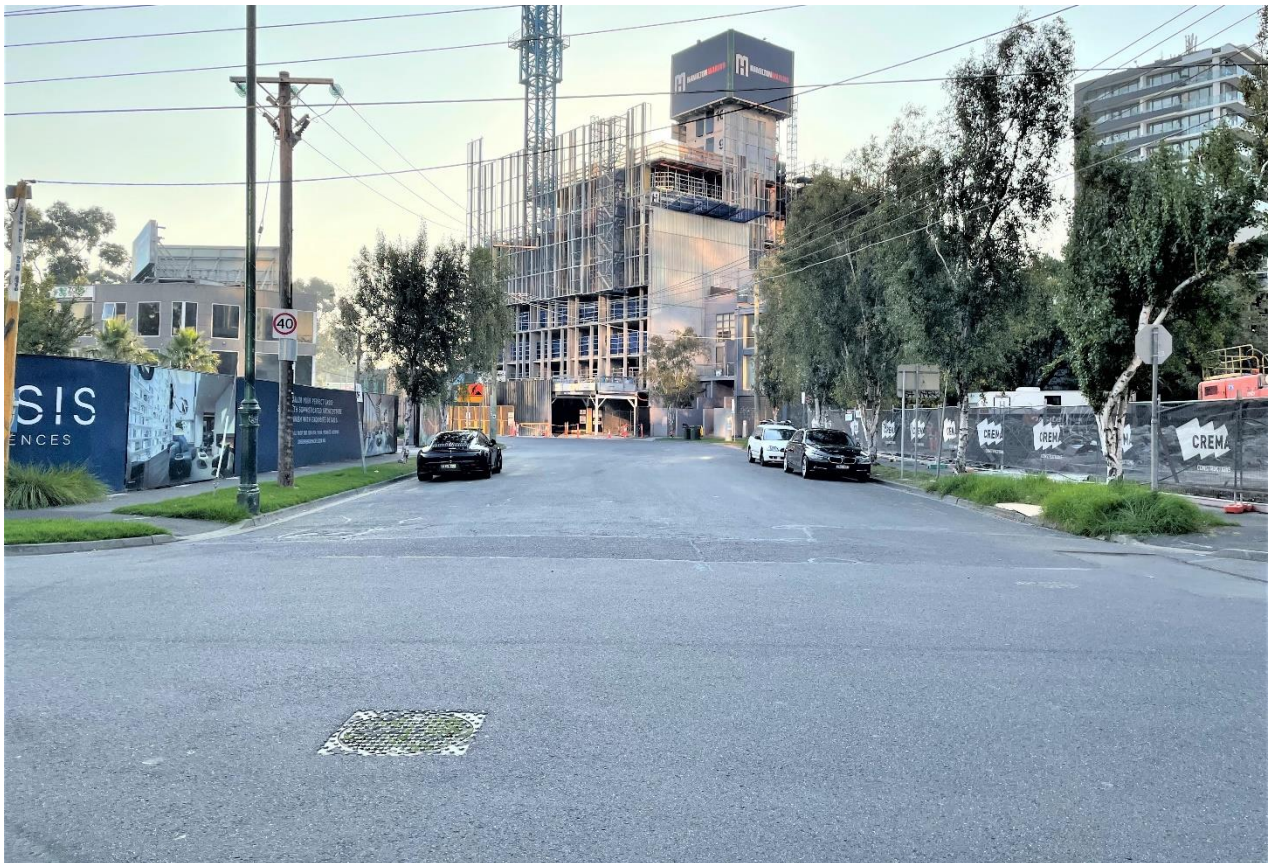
Kings Place Street at 1.00pm on Wednesday 14 April – looking west from Palmerston Crescent
